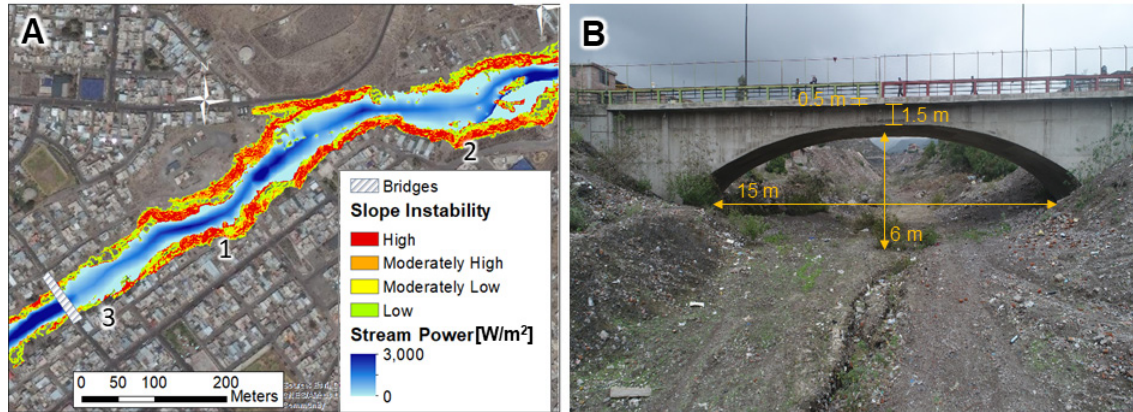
A) Slope instability and stream power of San Lázaro at three selected locations (1, 2, and 3). B) Drone footage of the bridge over San Lázaro depicted in A (location 3) and how it was used to get bridge dimensions. Slope instability is considered high when FS is less than 1, moderately high when FS is between 1 and 1.25, moderately low when FS is between 1.25 and 1.5, and low when FS is greater than 1.5.
